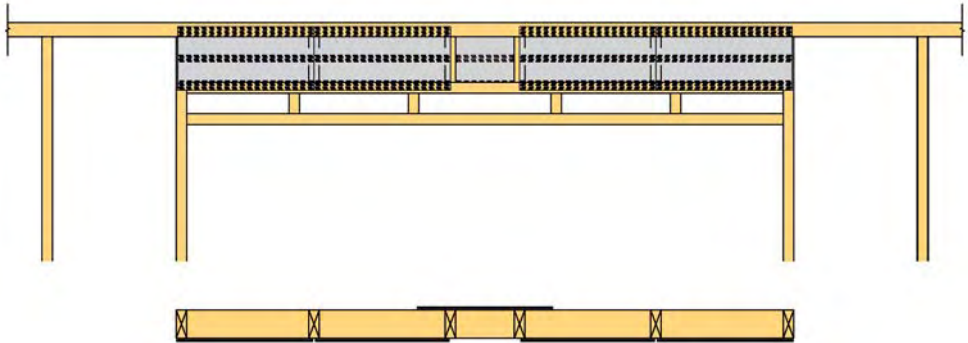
MiTek Lintel Utilising Top Plate as Top Flange
